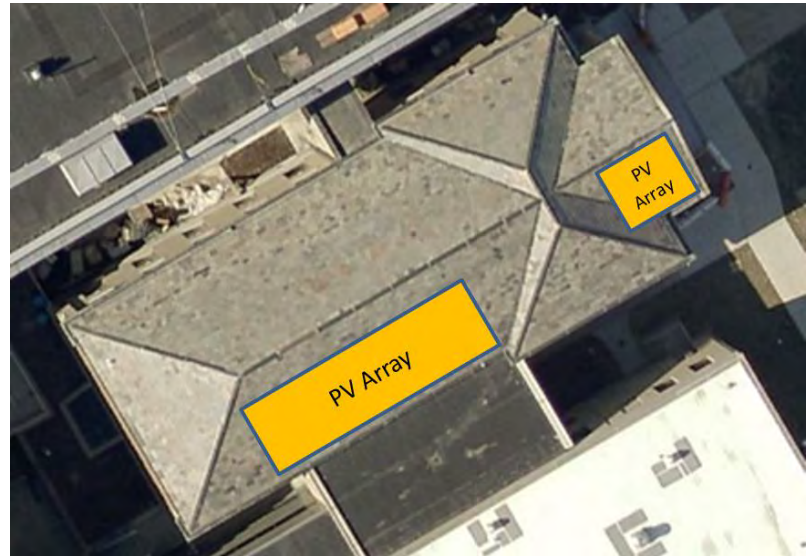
Roof of Supreme Court Building with possible PV array arrangement.
